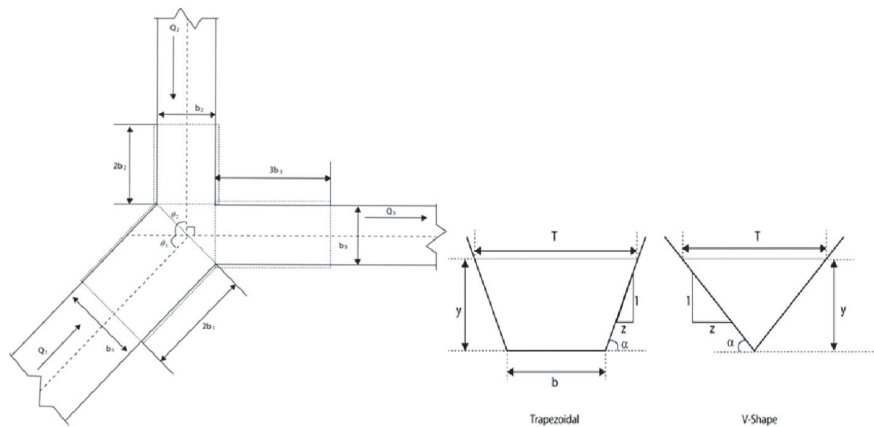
Schematic Layout of Combining Flow Type Junction and Geometric Details of the Typical Trapezoidal and V-Shape Cross Sectional Area
